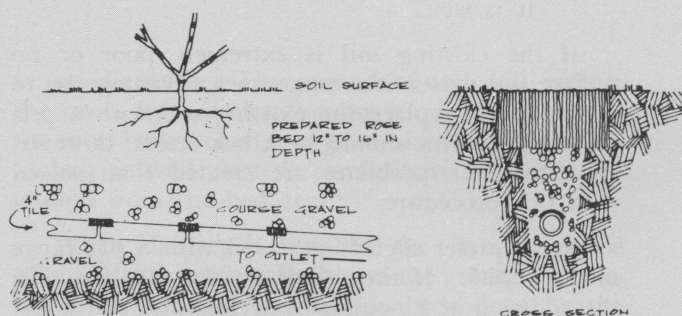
Ditch for tile drain should be 2 to 3 feet deep and slanted 3 inches to every 100 feet. Place 4 to 6 inches of coarse gravel in the bottom of the ditch. Lay 4-inch concrete tile end to end. Cover tile joints with asphalt roofing paper to prevent entry of loose soil. Tile should drain into a ditch, storm sewer or a dry well.
